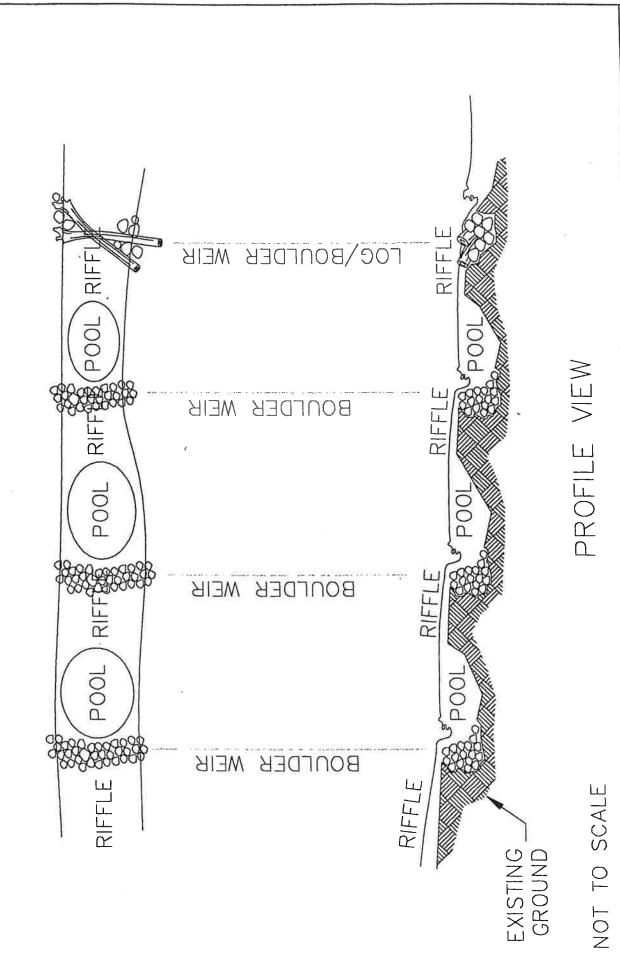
ROSEWOOD CREEK CONCEPTUAL DESIGN PLANS
